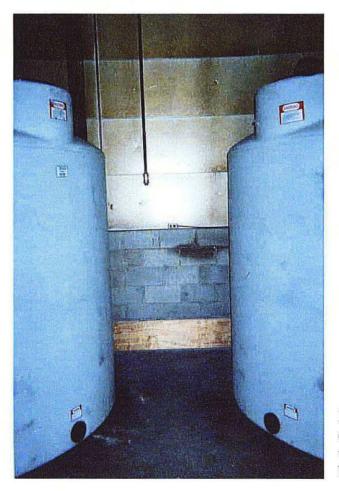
Looking west, picture of the completed spill containment wall and 20-mil liner as viewed from between the tanks.
